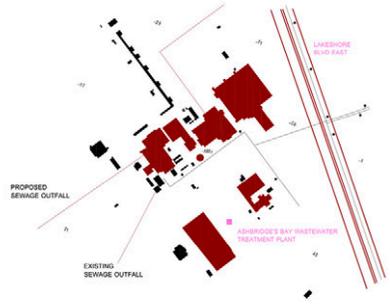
Detail - Hearn Generating Station and Ashbridges Bay (image by author)
